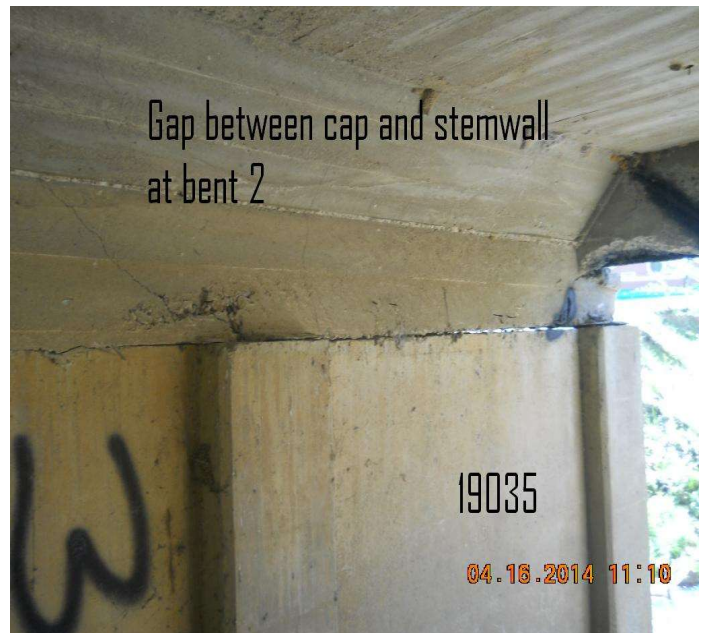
Description Bent 2, gap between cap and stem wall.
